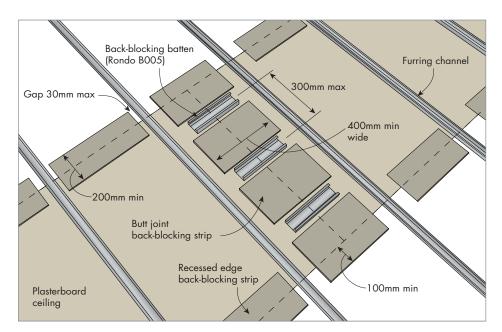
Placement of Back-Blocking Batten and Back-Blocking Strips for Recessed and Butt Joints
